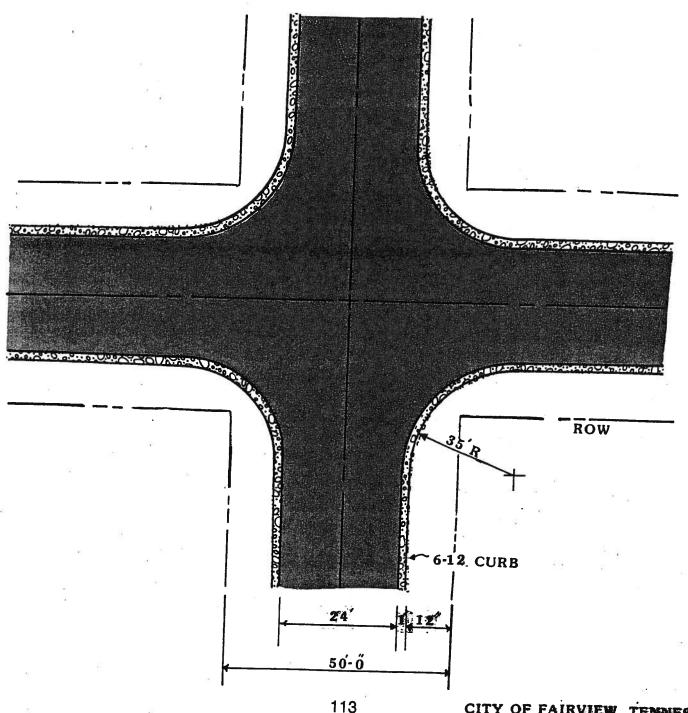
A Road Sections for Commercial-industrial Streets
